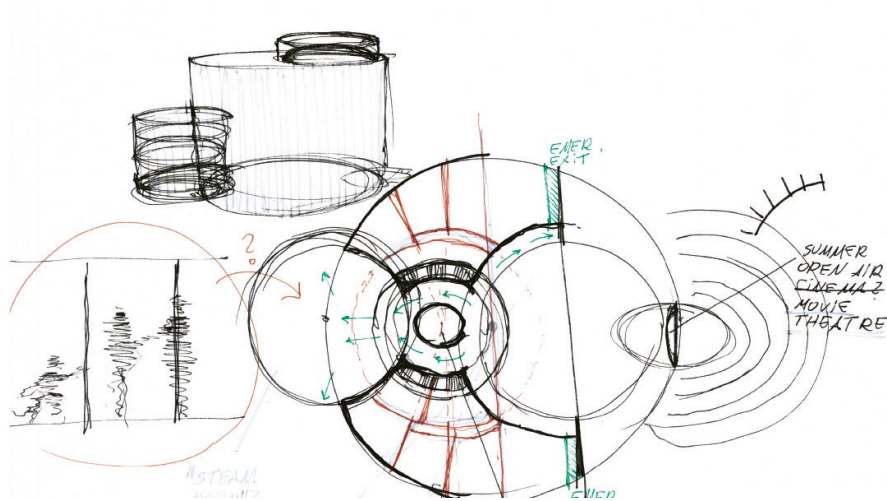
Initial sketch of building plan with fire safety considerations.
